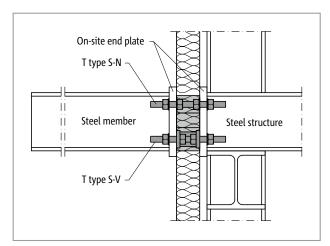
Schöck Isokorb® T type S for cantilevered steel structures
